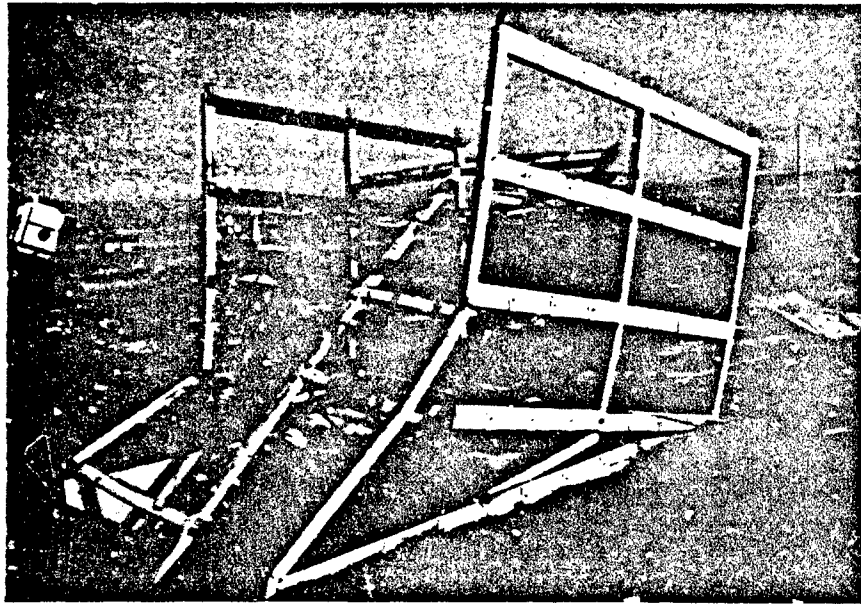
Posttest Photographs of Column Line ③ of the Steel Frame Building, Experiment 4140.
